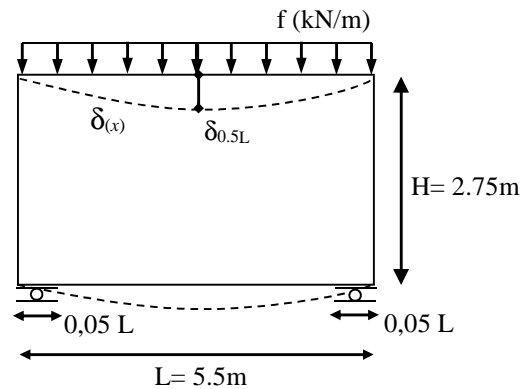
Structural model used for the simulation of the reference masonry partition wall
